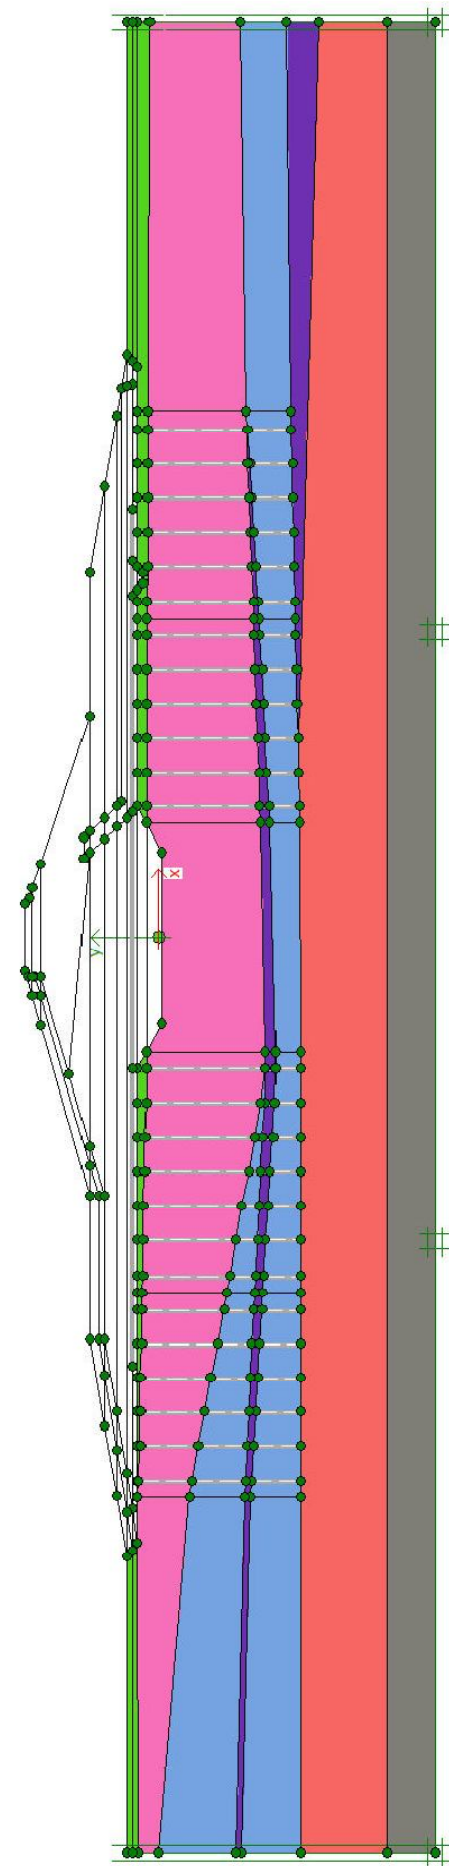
Ground excavation up to the level of the embankment foundation and cut-off - PK0+240 of Dike No.1
